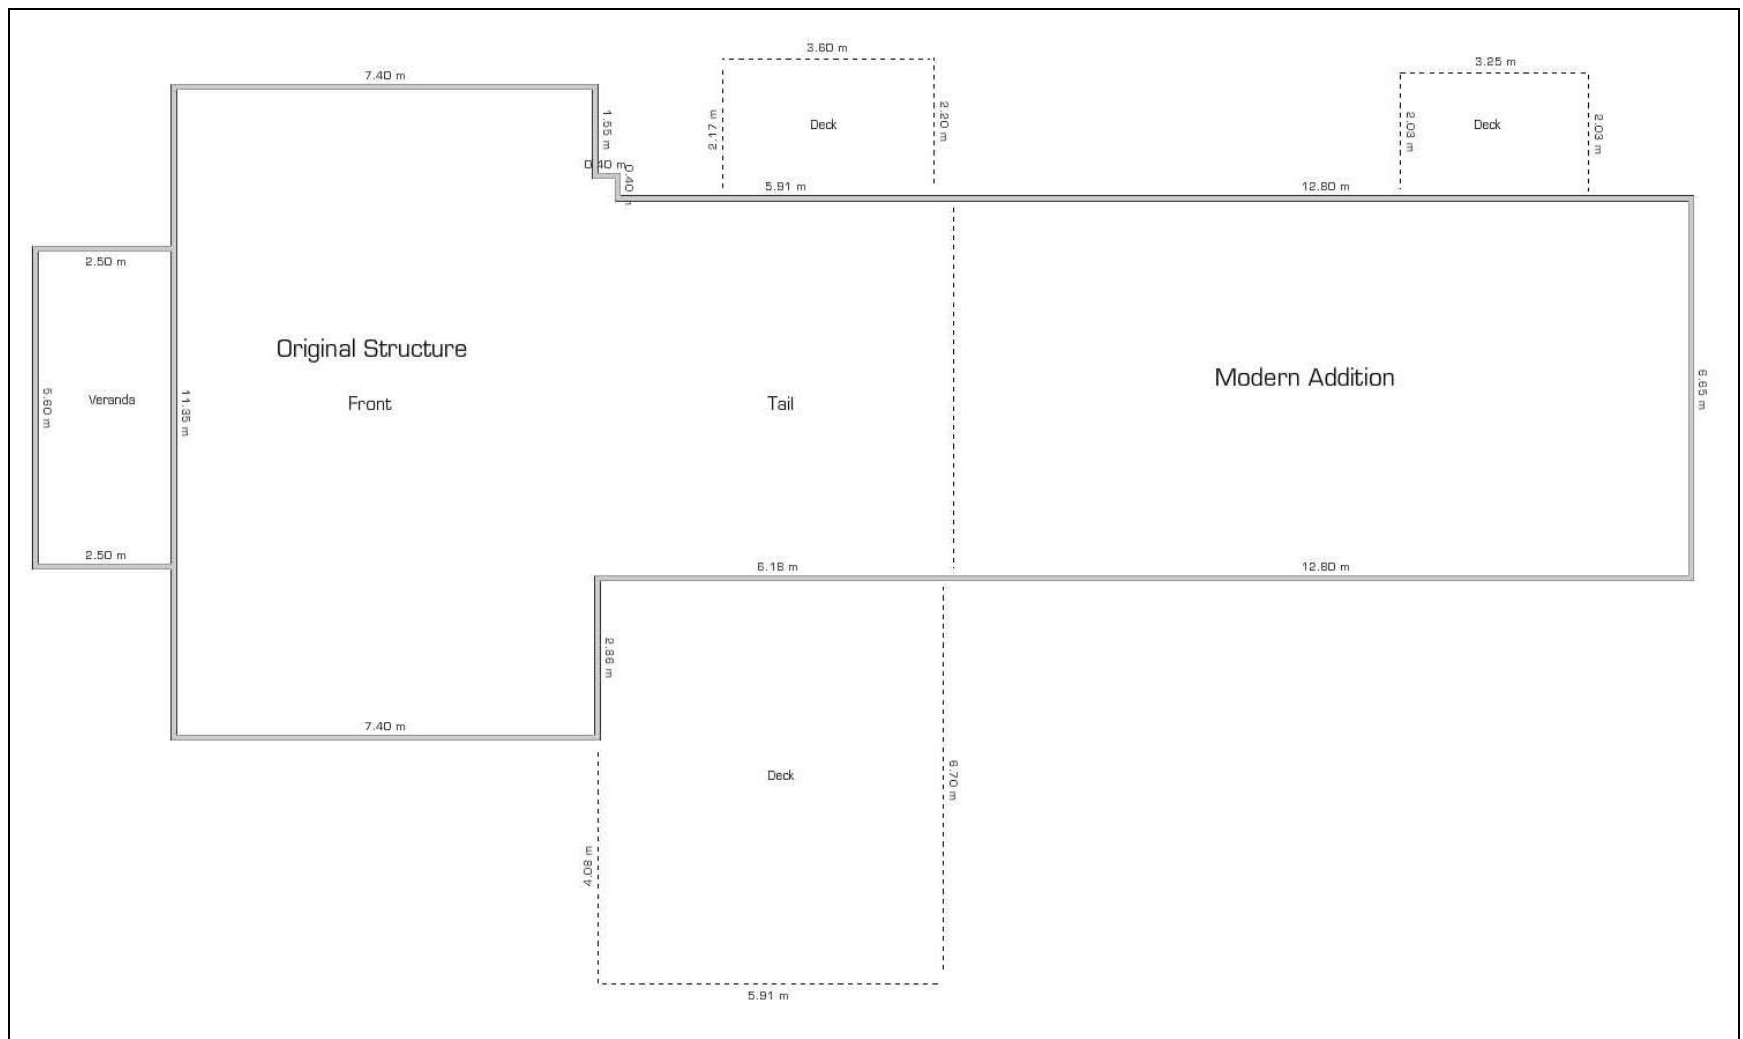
Floor plan of built heritage resource showing overall dimensions of the residence footprint
